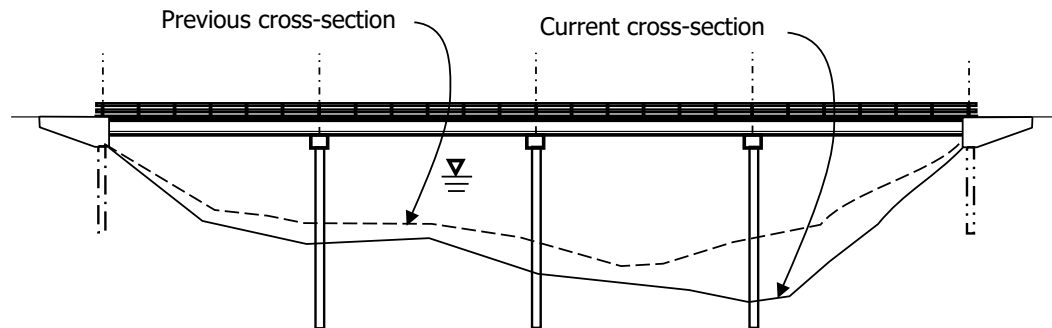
Elevation view showing current cross-section and previous cross-section for a bridge over water.
